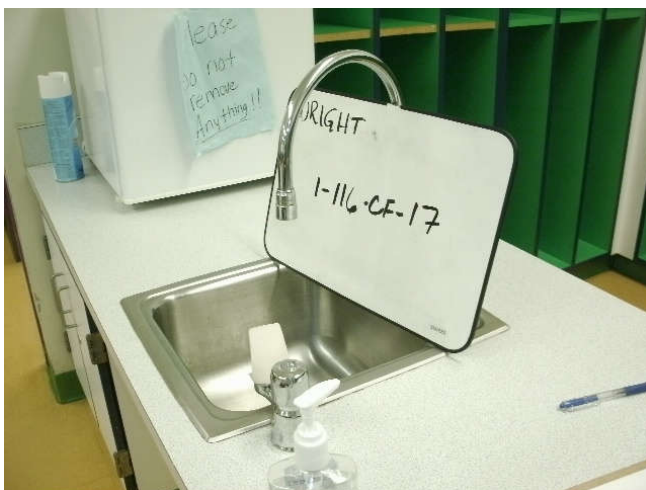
Classroom faucet w/bubbler, located on the 1<sup>st</sup> floor, in room 116.
